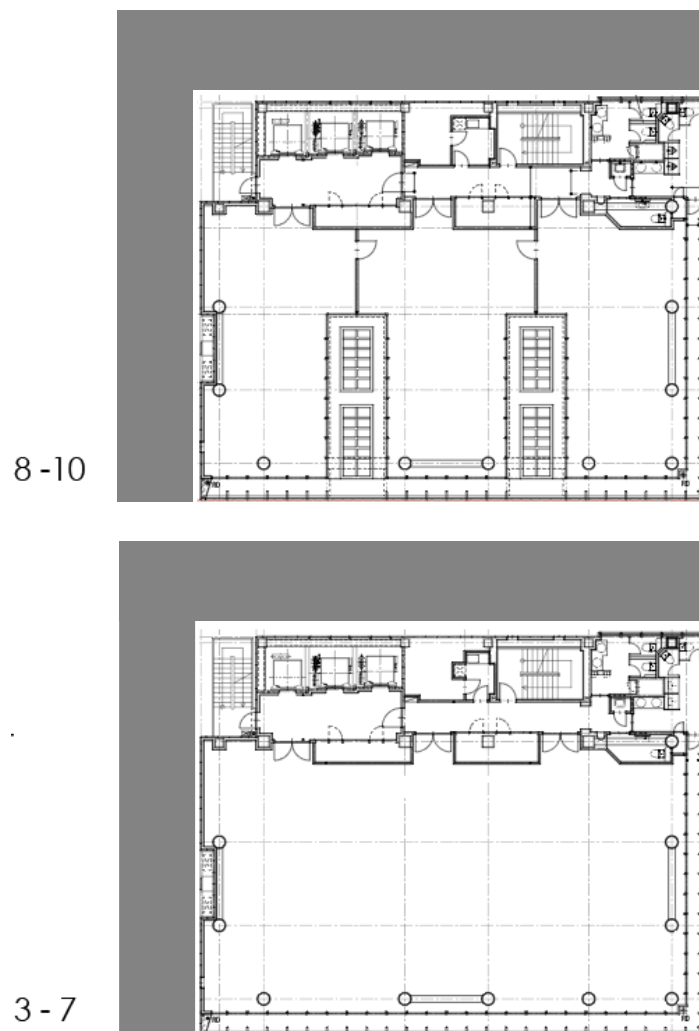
Two types of Office floor plan: Typical Office 3-7F & Executive Office 8-10F
